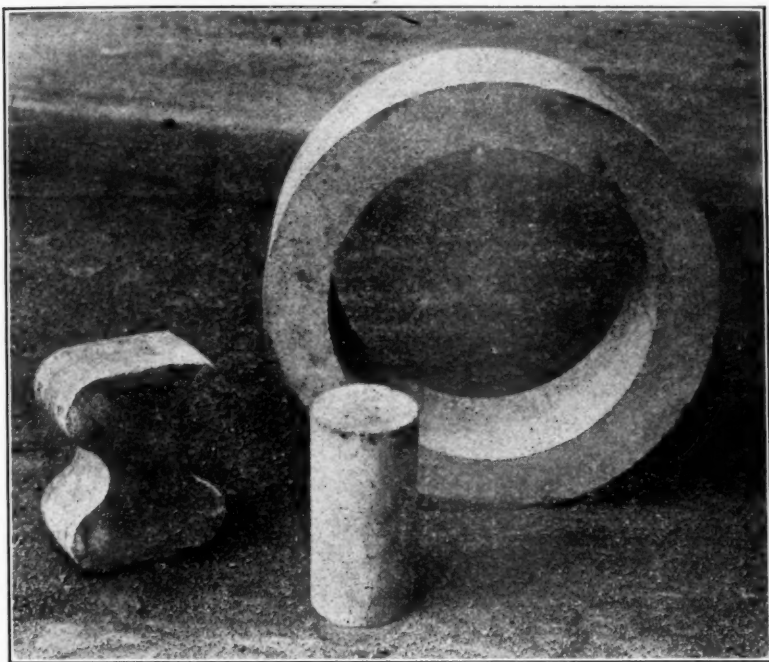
Specimens Used in Tests (about $\frac{1}{12}$ Natural Size).
